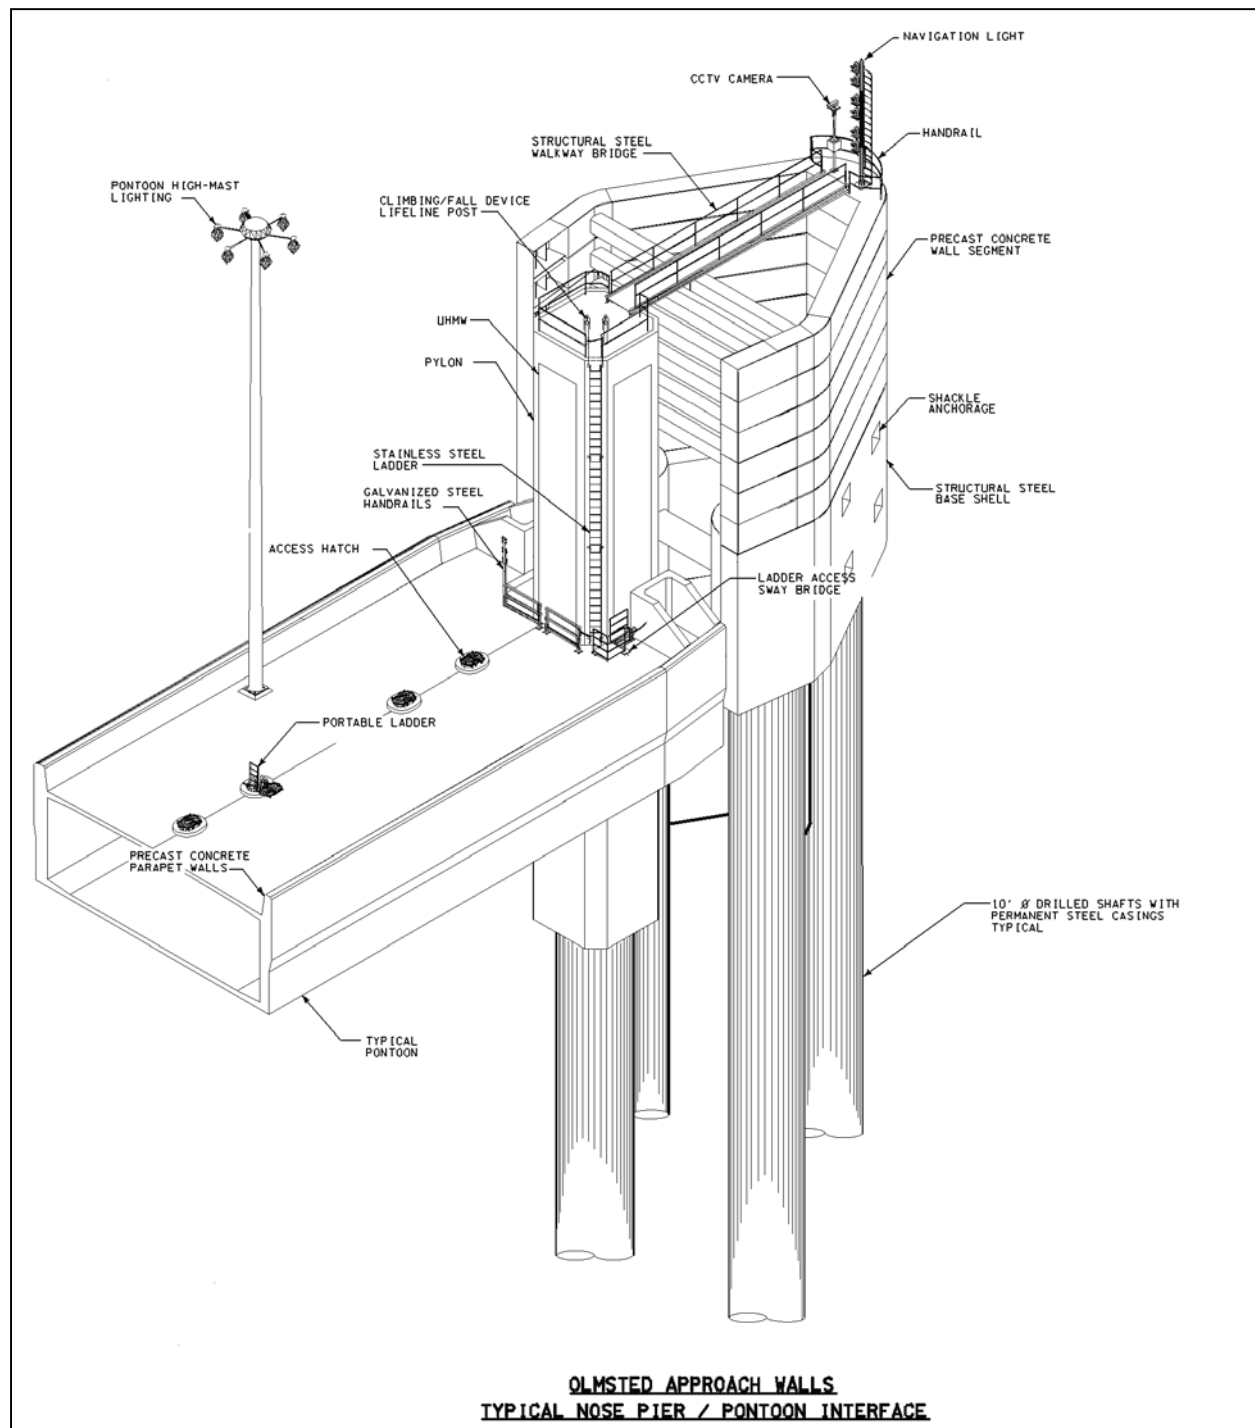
Detail view of floating approach wall connection to nose pier, Olmsted approach walls. Approach wall is a hollow precast concrete shell fabricated offsite and connected to preinstalled piers
